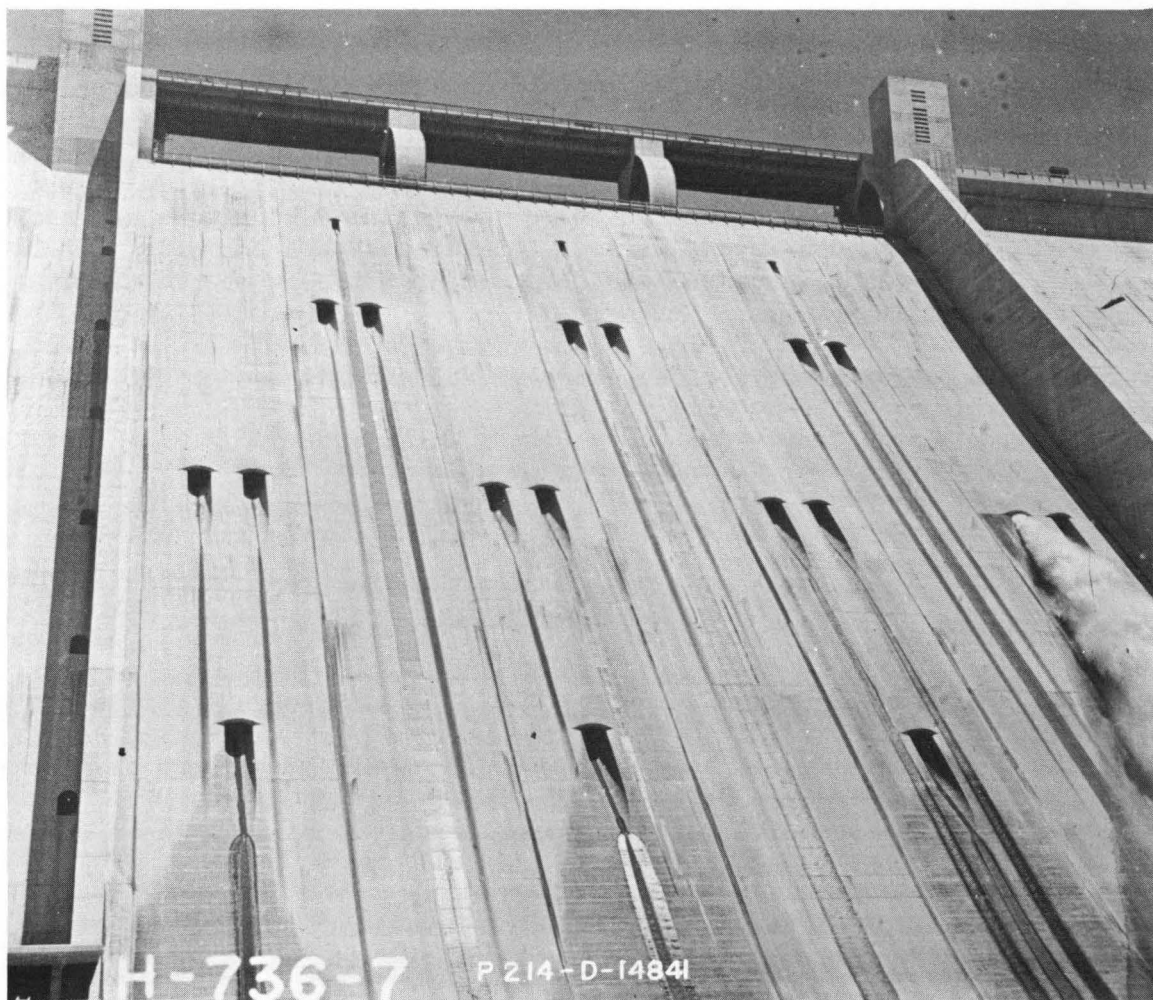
Shasta Dam--102-inch outlets--Spillway section
